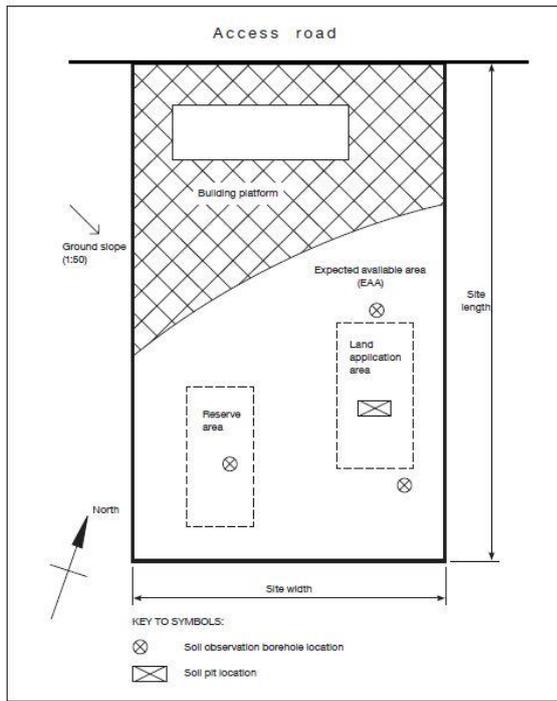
Generalised site plan for a single lot (AS/AZS 1547: 2012)
